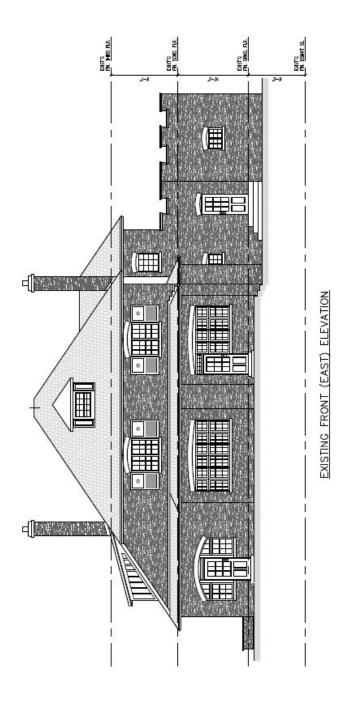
The front or east elevation of 1341 Stavebank Road as it exists in 2020. (Image from owners.)
